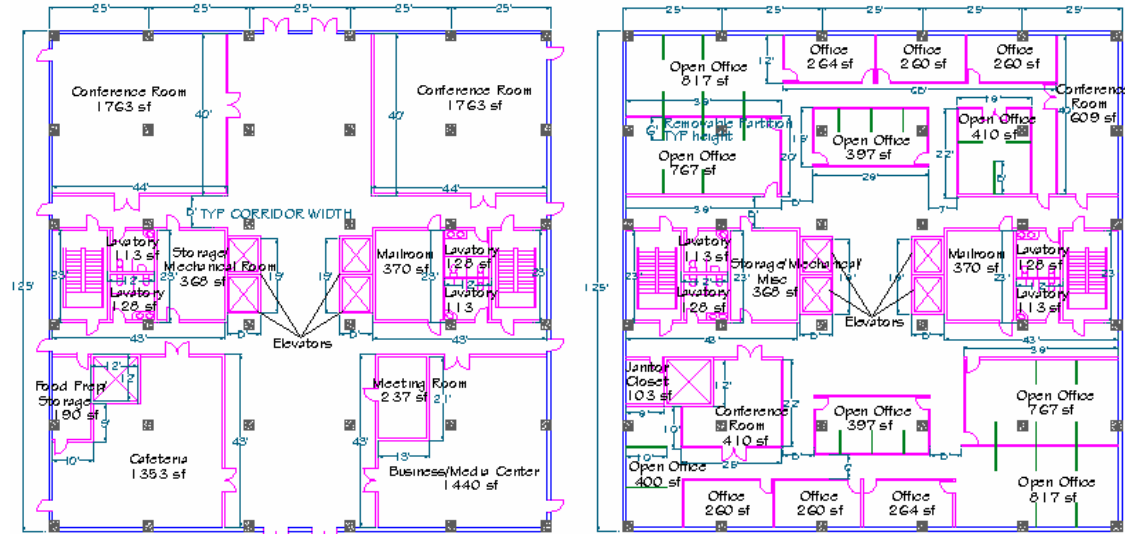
Architectural floor plans developed for typical highrise office building for (a) ground floor and (b) typical office floor.
